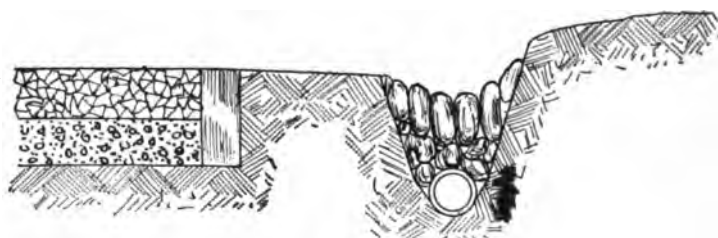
COUNTRY ROAD, WITH EARTH BERM AND TILE-DRAIN.
